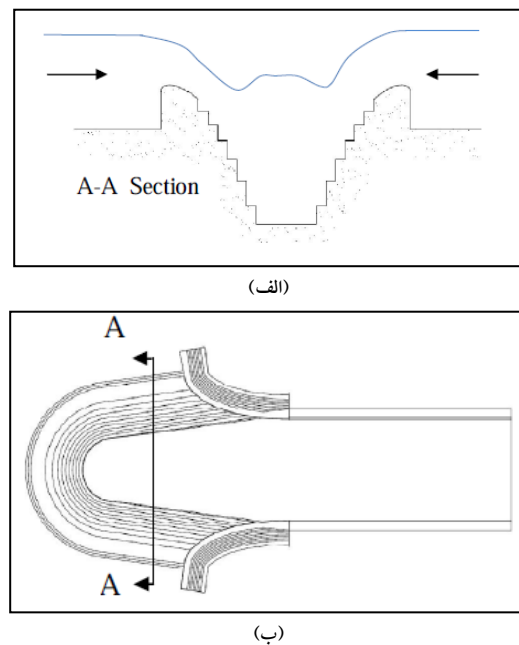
Stepped three sided spillway (a) plan (b) cross-section
